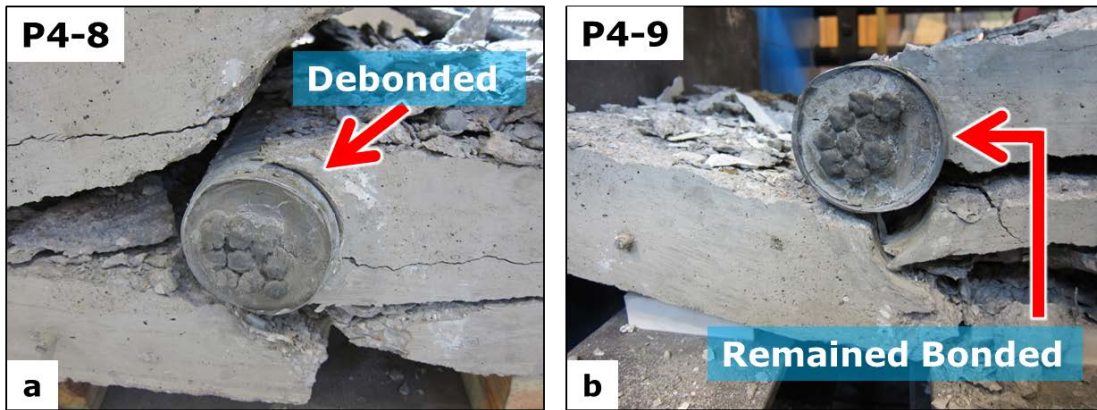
Failures of Panels with Waxed, Steel Ducts
